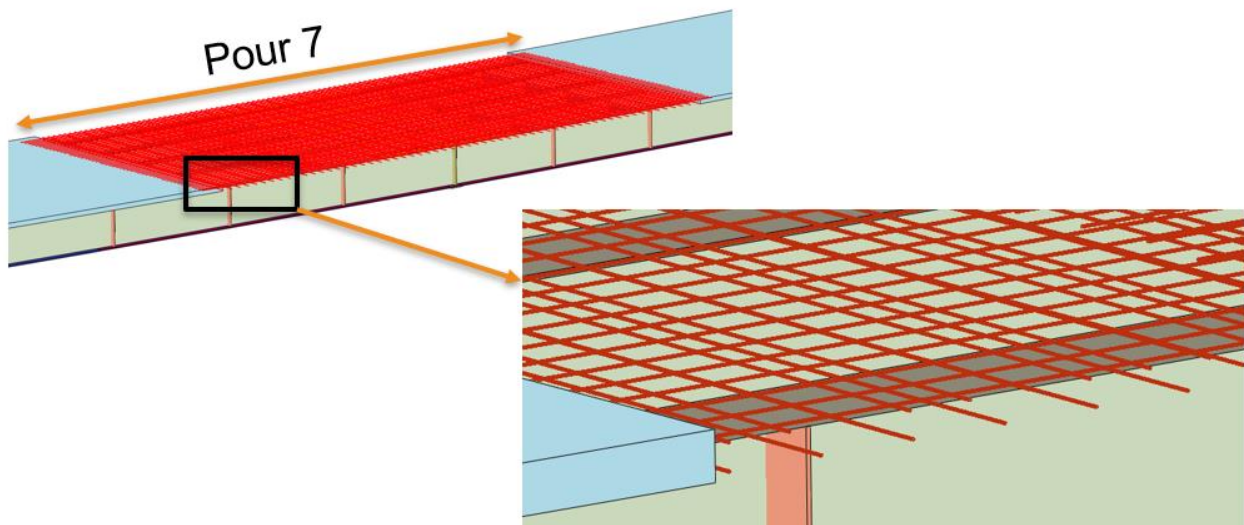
Reinforcing steel modeled with truss elements only in Pour 7.
